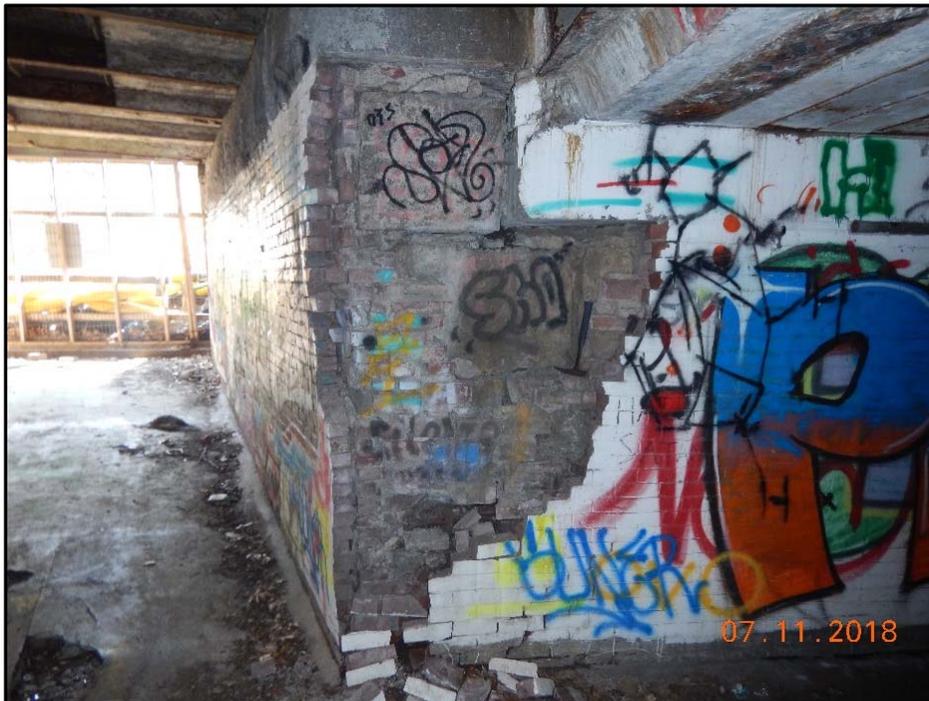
South wall, east corner – up to 5’-0” wide x 8’-1” high area of missing bricks on the first layer and 3’-6” wide x 2’-10” high area of missing bricks to the second layer.
